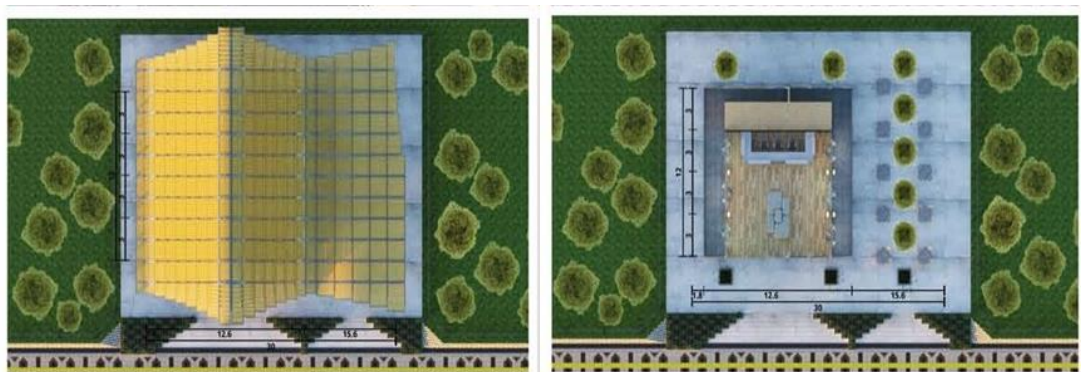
Roof Plan and Floor Plan of Proposed Design The Jakarta's Tourist Information Center
